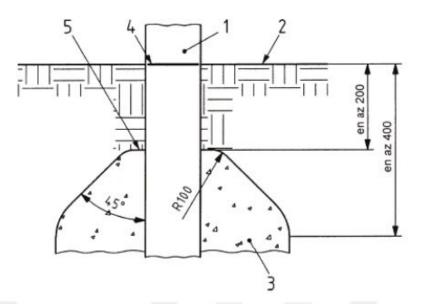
Dimensions for Foundations (Source: CEN, EN 1176-1:2017)
